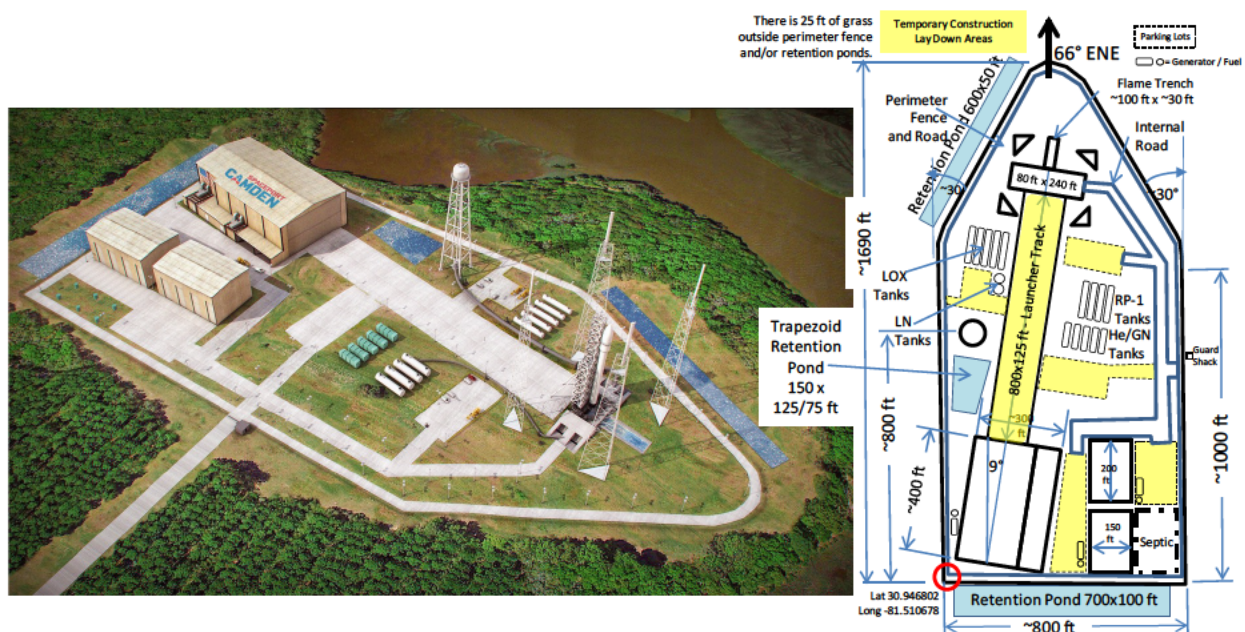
Vertical Launch Facility (Artist Rendering & Layout Schematic)
